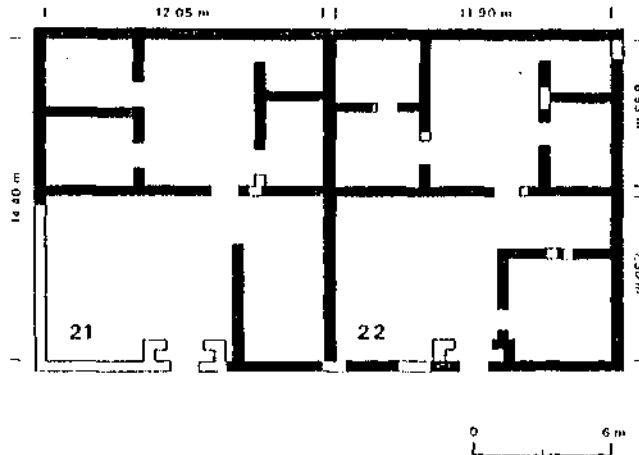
Plan of houses 21 and 22 (Source: Reinders 1989, Fig. 3).
